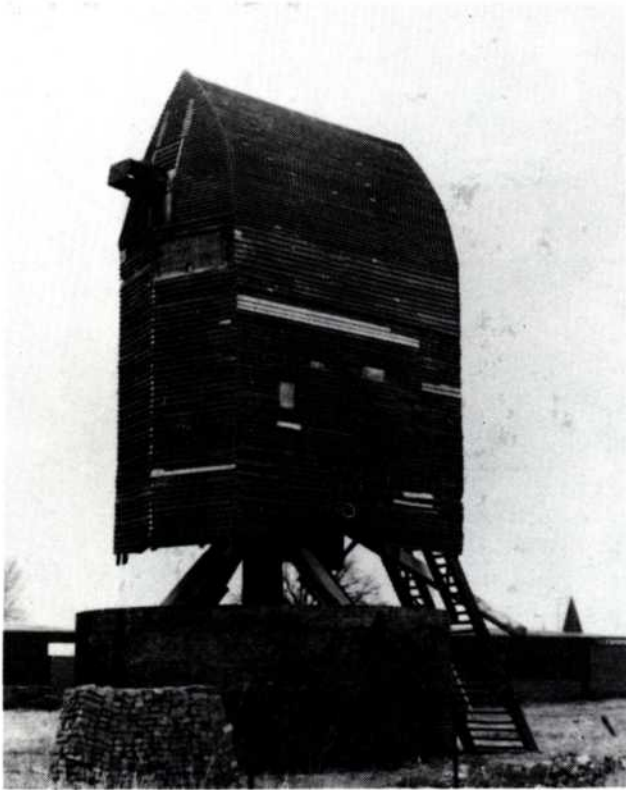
The mill just prior to dismantling, the pile of bricks being salvaged from under the concrete floor.
